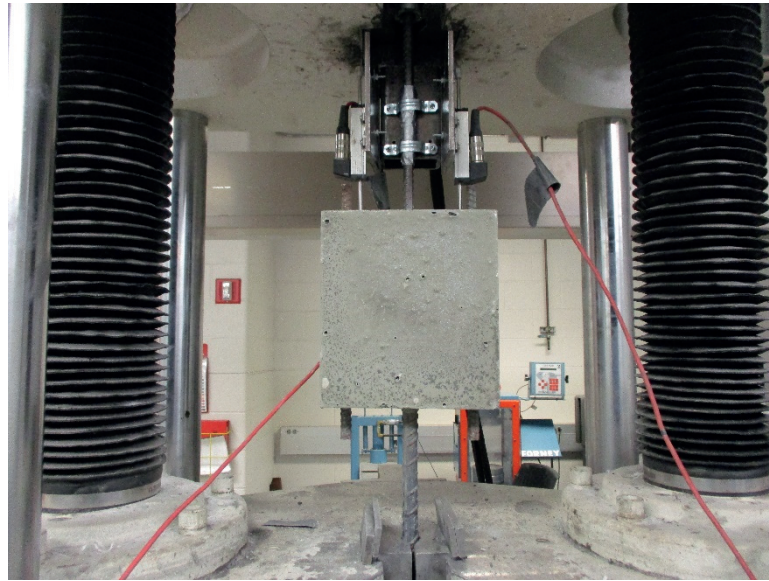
Rebar Pullout Test Setup of Commercial UHPC Mix.
